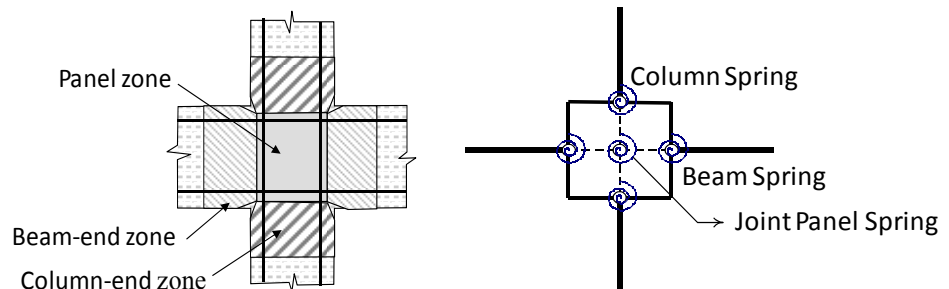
Idealization of reinforced concrete beam-column joint.
